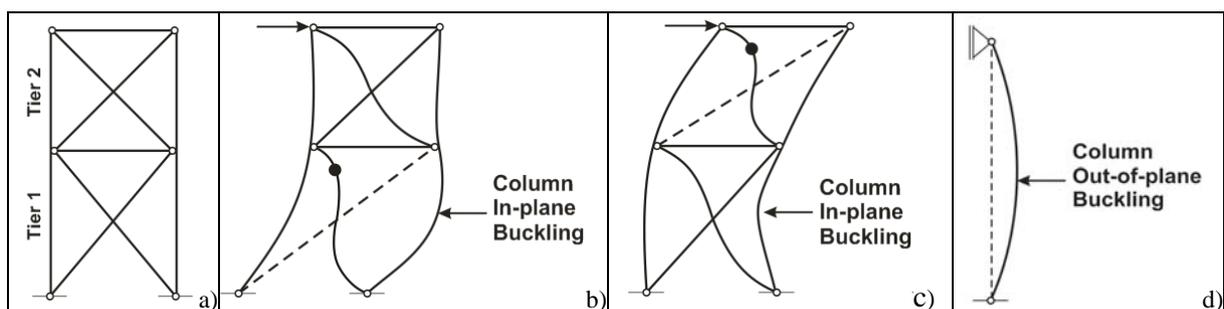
a) Two-tiered steel braced frame; b) Column in-plane buckling following brace yielding in Tier 1; c) Column in-plane buckling following brace yielding in Tier 2; d) Column out-of-plane buckling.
